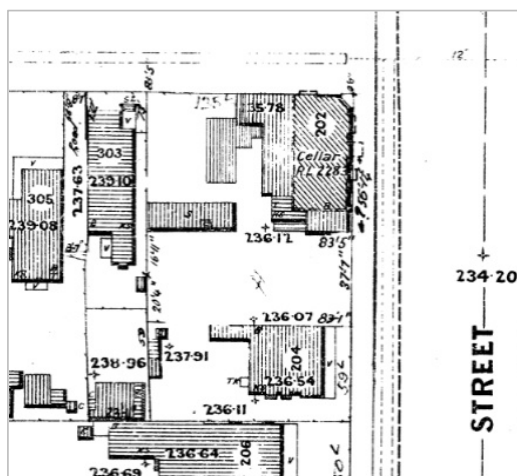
Detail from a Ballarat sewerage plan dated 1927, showing the footprint of the building and stables at the rear. (Source: PROV)
